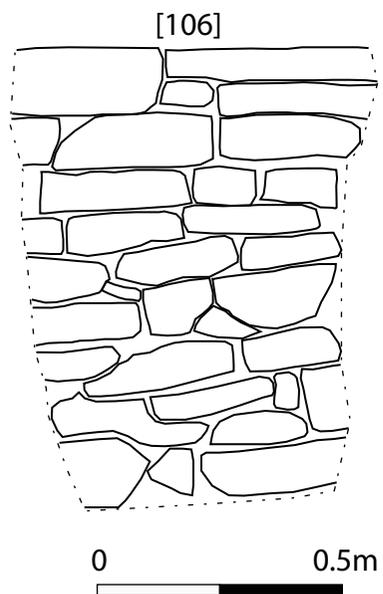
Illustrations showing face of wall [106/206] detail within trenches 1 and 2
